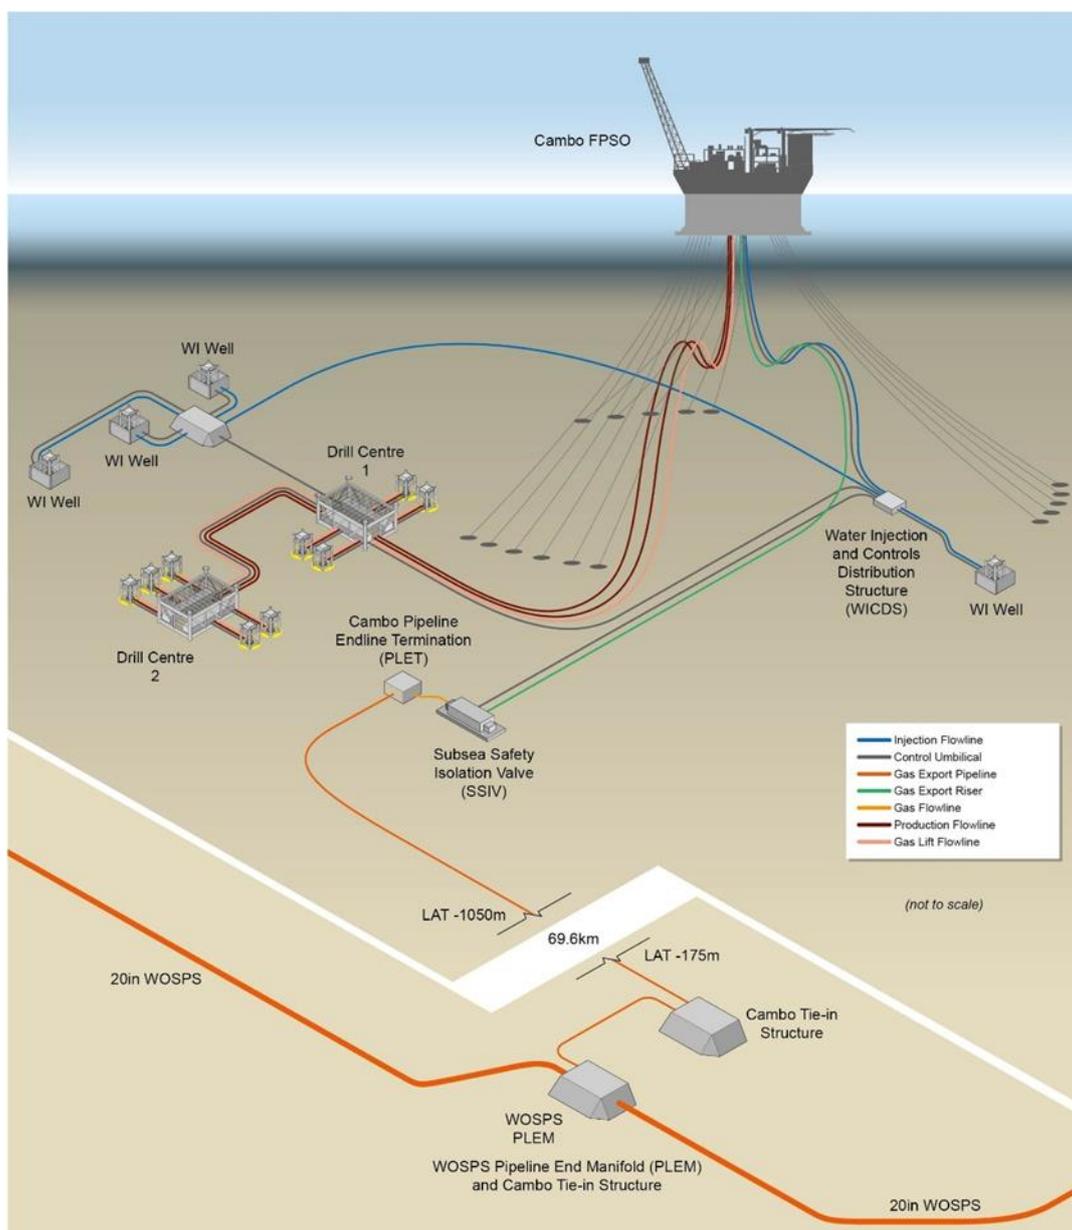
Overview of the Proposed Field Development Layout (indicative illustration - not to scale)
